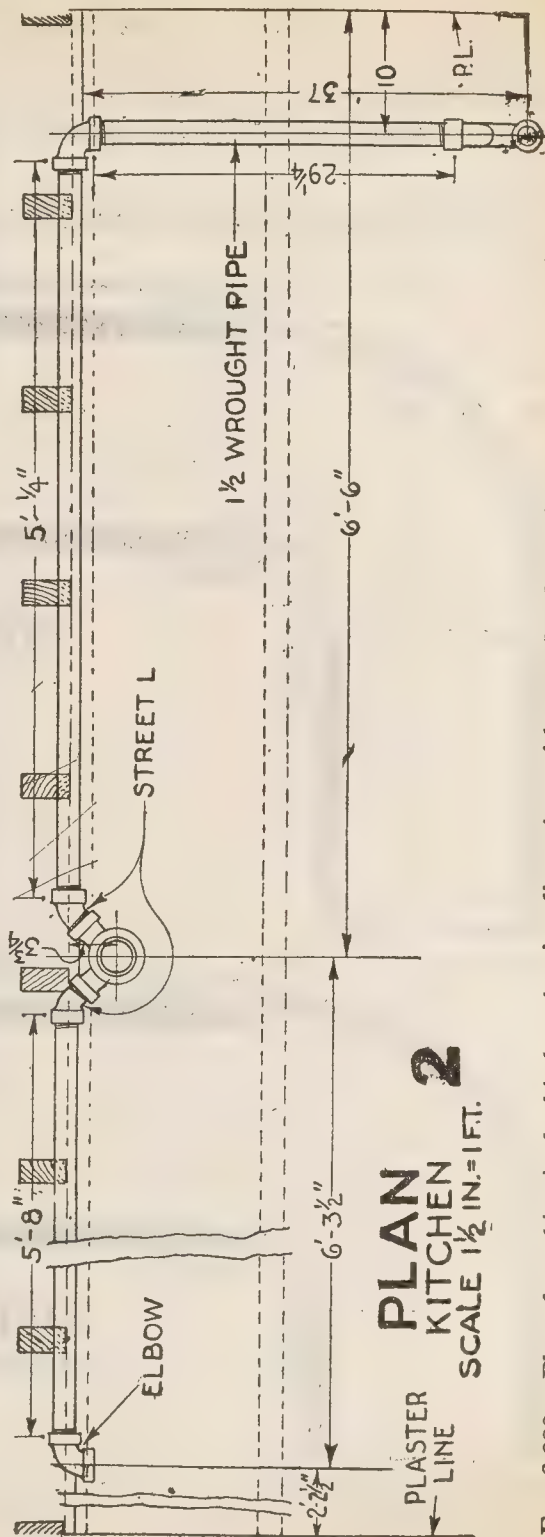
,980.—Plan of roughing in for kitchen showing dimensions with wrought pipe and recessed screwed fittings.
